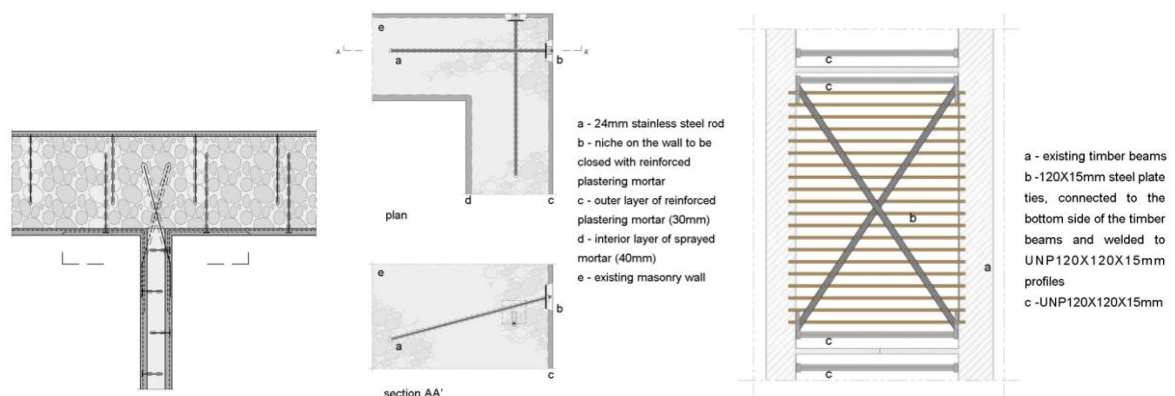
Examples of improvement of the connection between orthogonal walls and stiffening of floor structures through the addition of steel plates (A2P)
